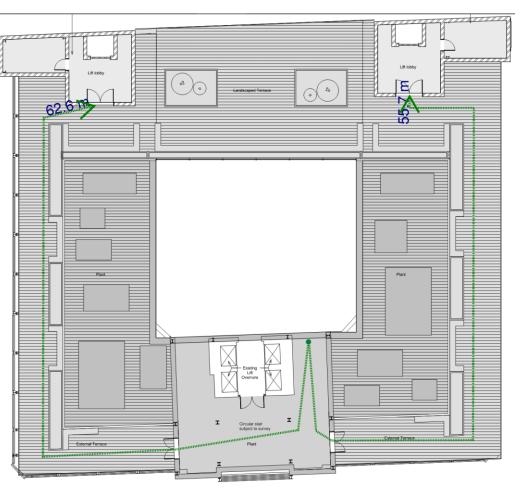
Travel Distances – Rooftop Plant Space – final drawing still under development
